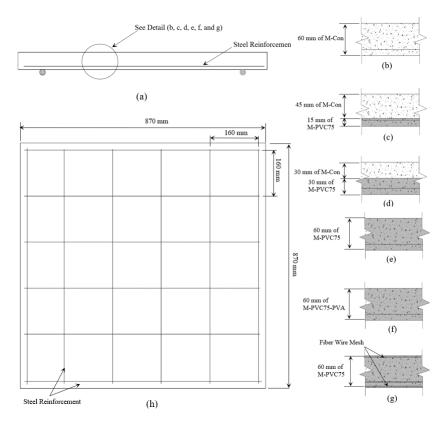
(a) Elevation view, (b) Con, (c) PVC-15, (d) PVC-30, (e) PVC-60, (f) PVC-60-PVA, (g) PVC-60-Fiber, (h) plan view specimens.
